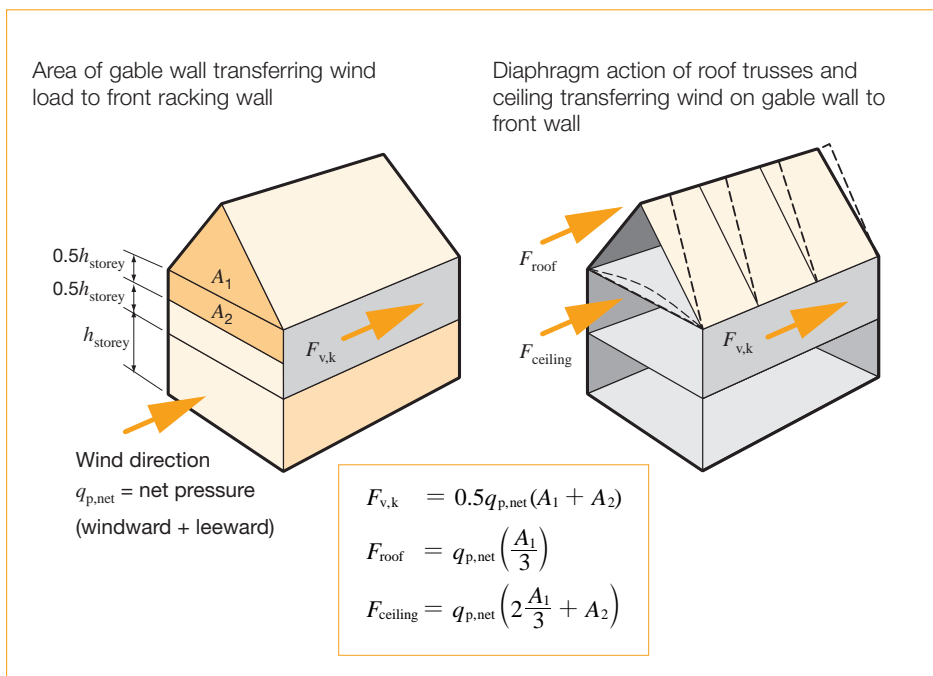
Racking load on first floor front wall from wind on gable wall
